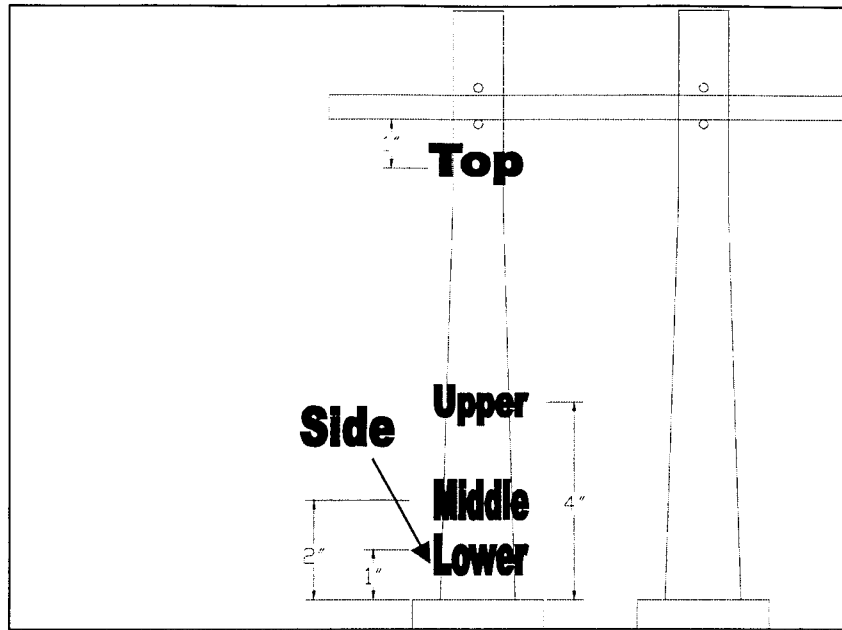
Strain Gauge Location on Full-Scale Damper
